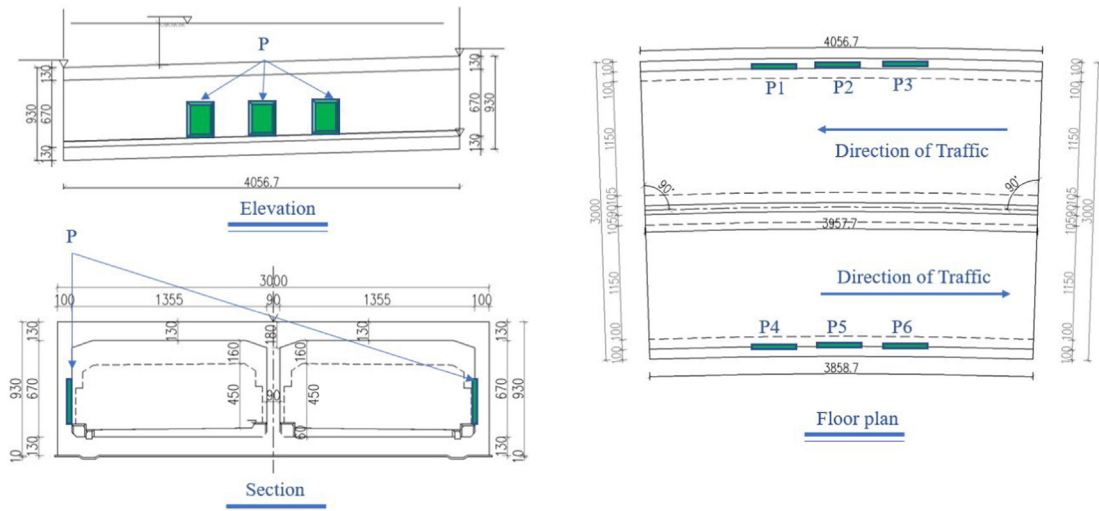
Schematic drawing of the precast concrete slabs placed in the tunnel.
